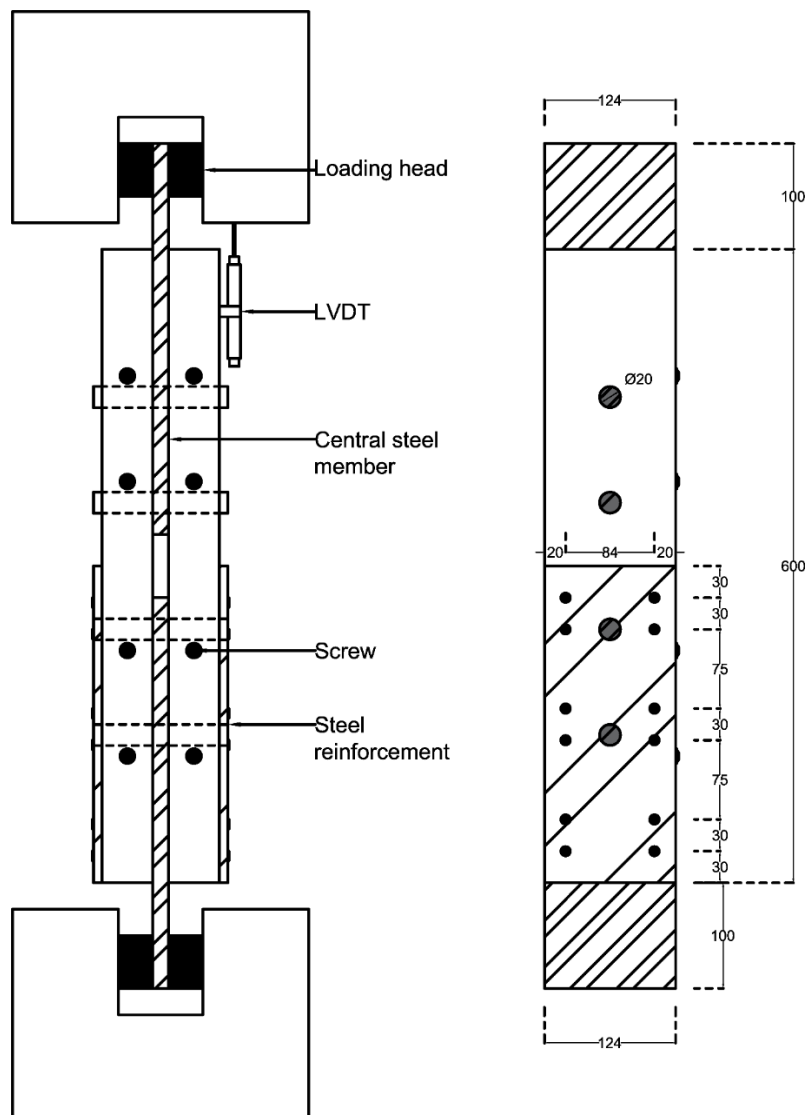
Specimen set-up (left) and dimensions for the specimen (right).
